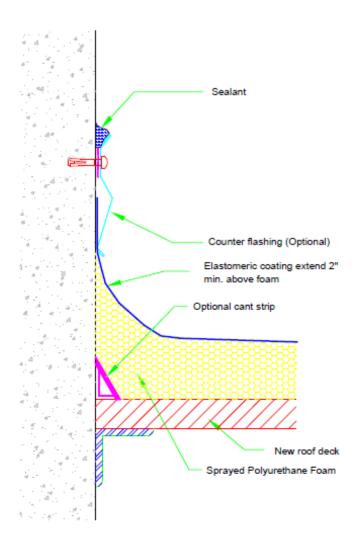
EXISITING PARAPET WITH COPING
